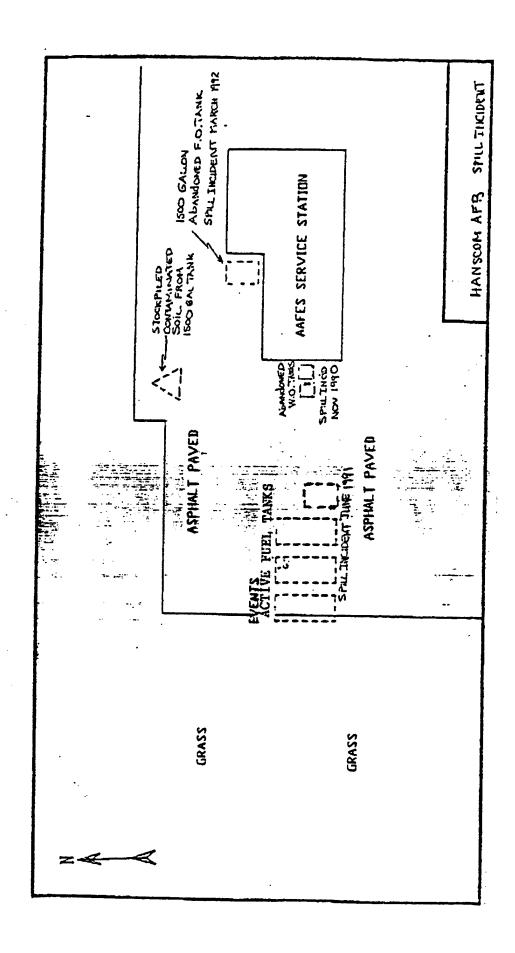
SITE DIAGRAM FOR BUILDING 1639
